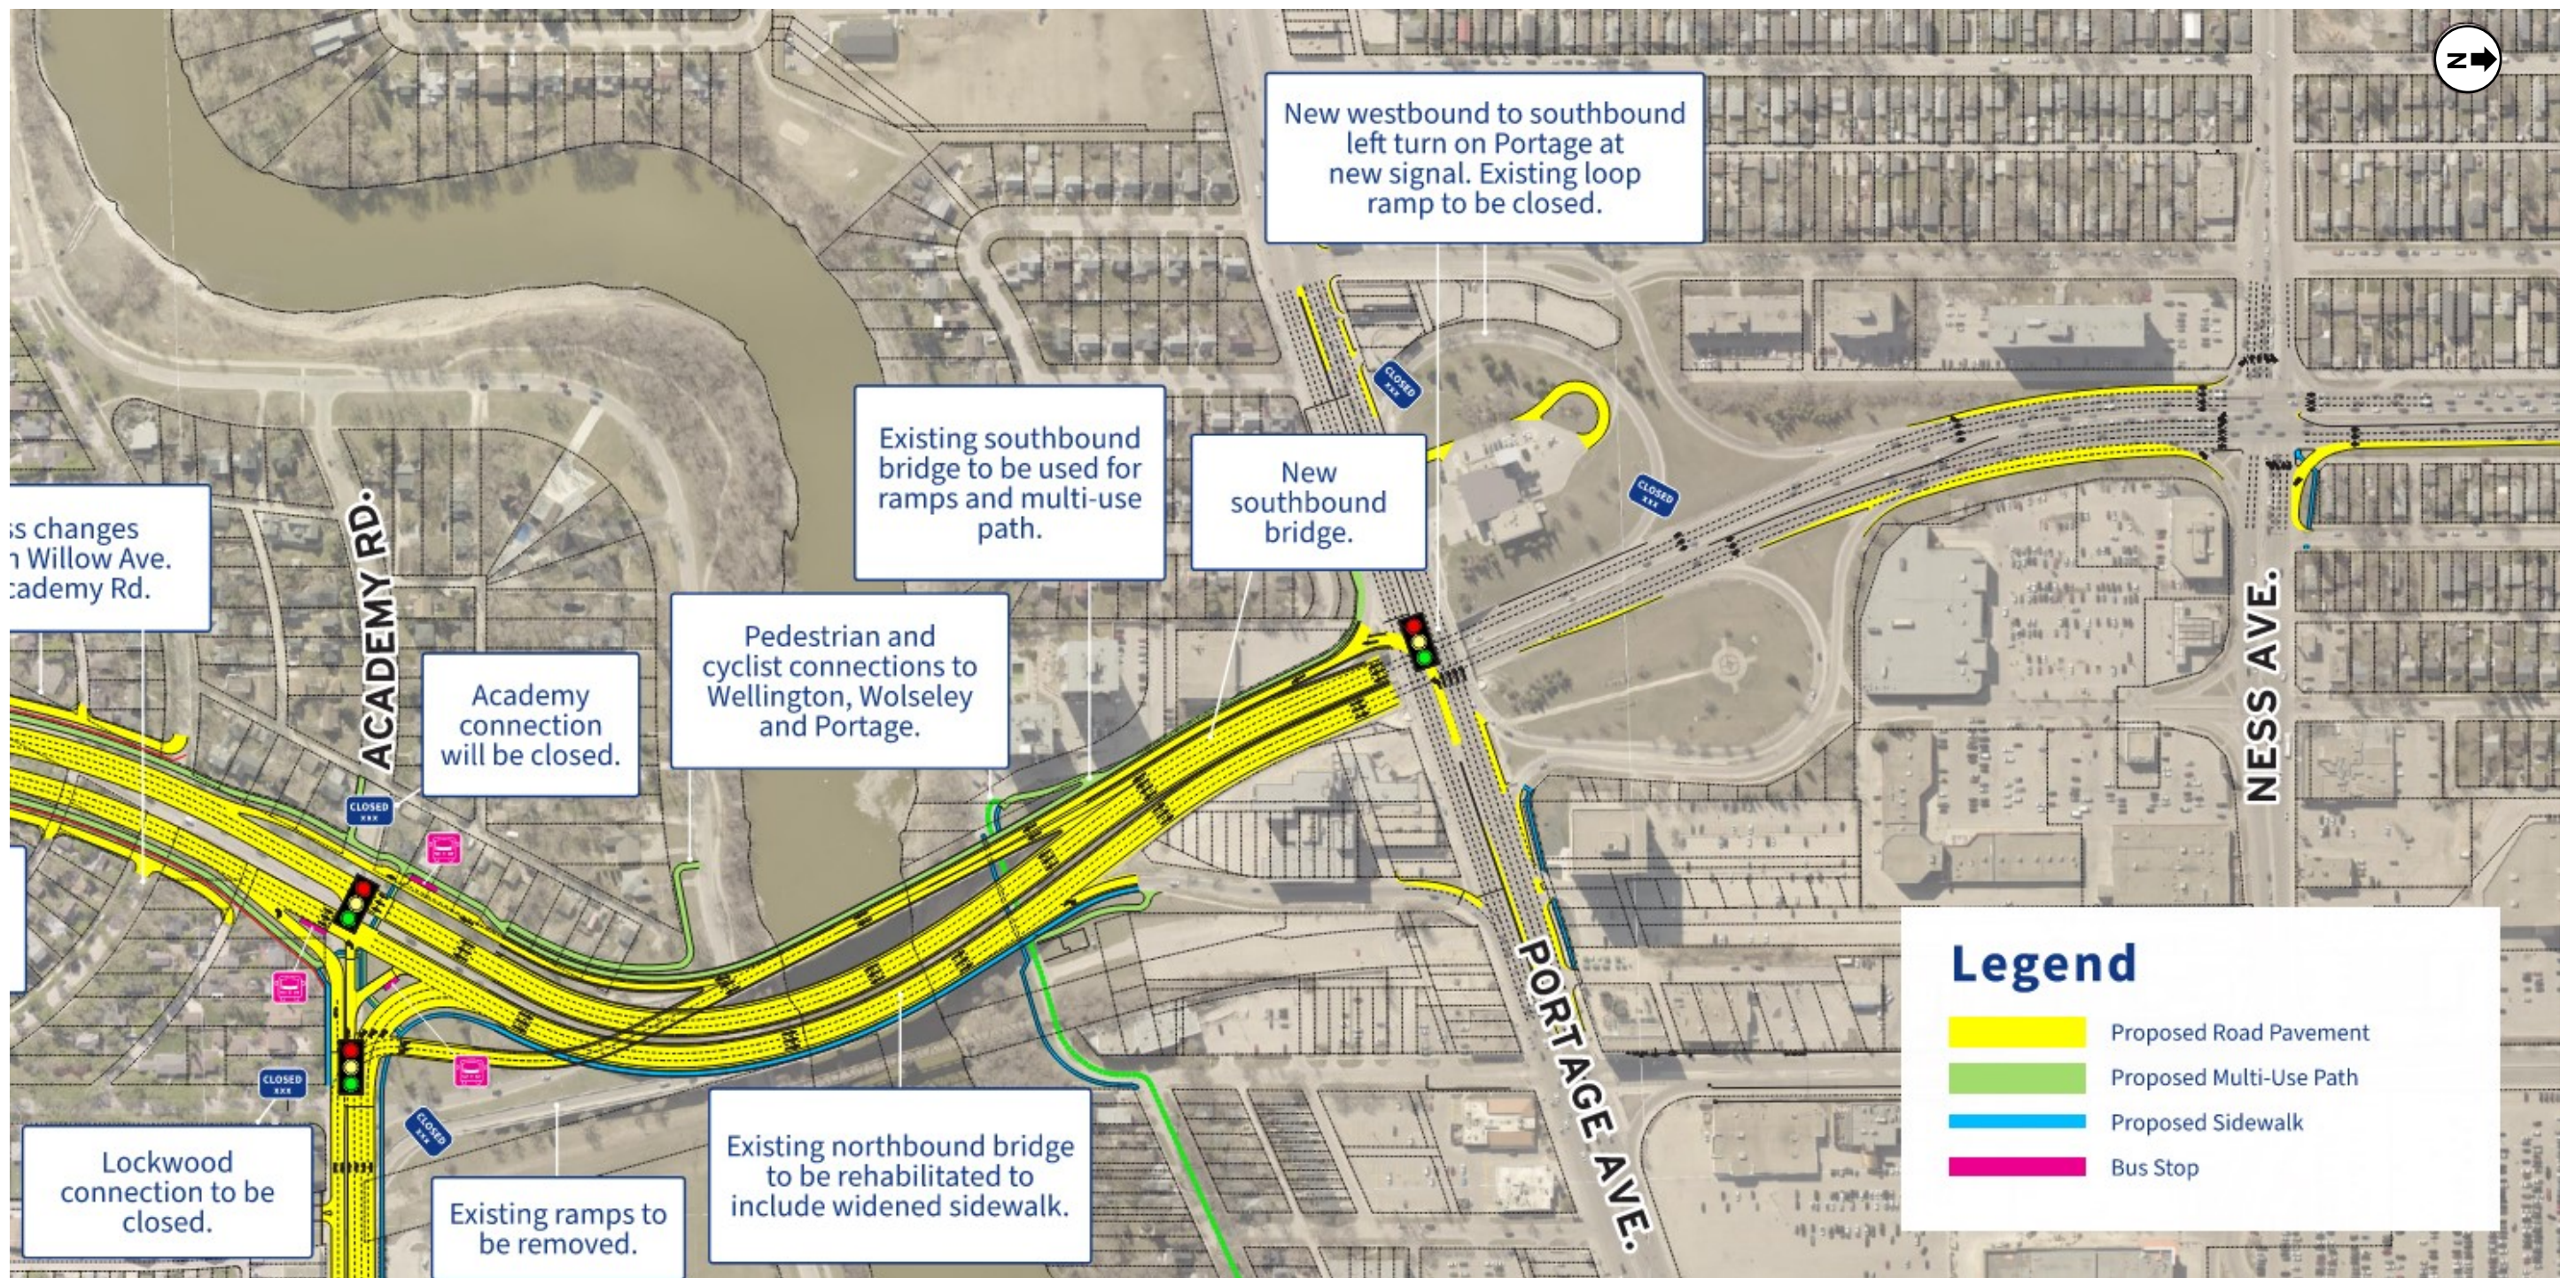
Key Design Elements – Academy Road to Ness Avenue
